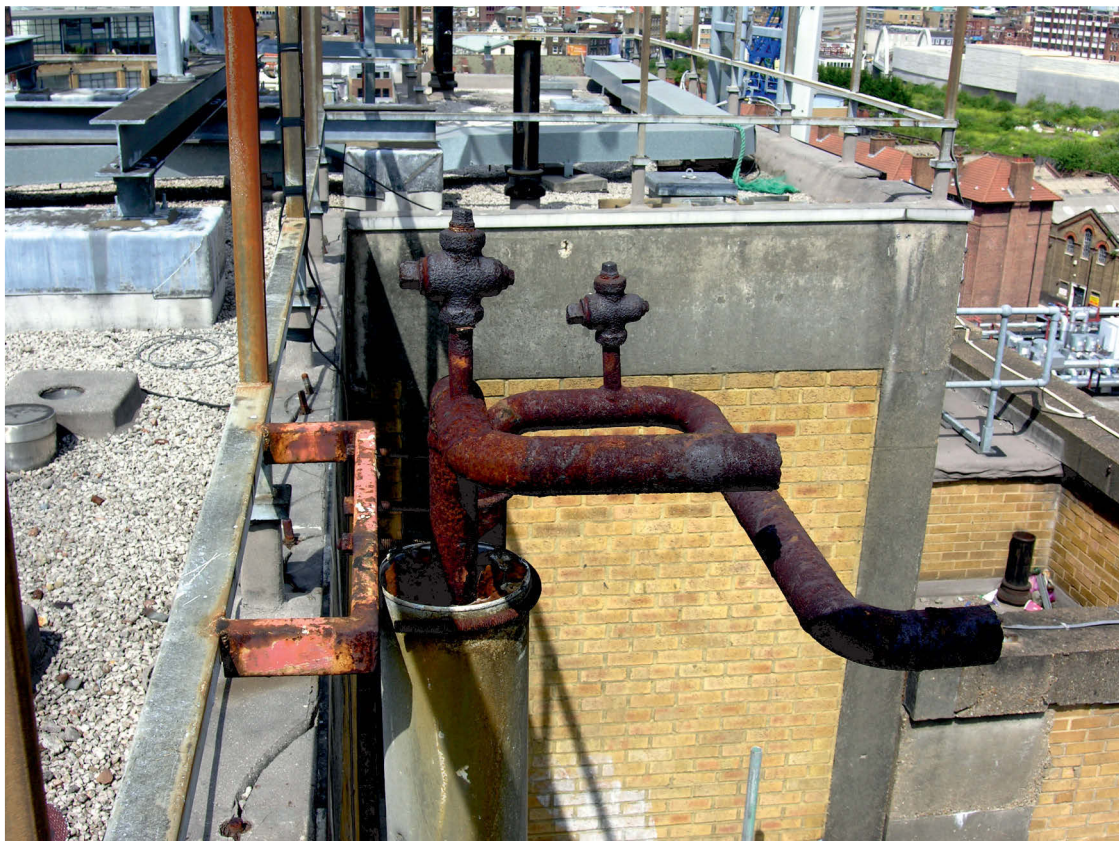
Disused pipes on the rooftop of Area 3, looking west
